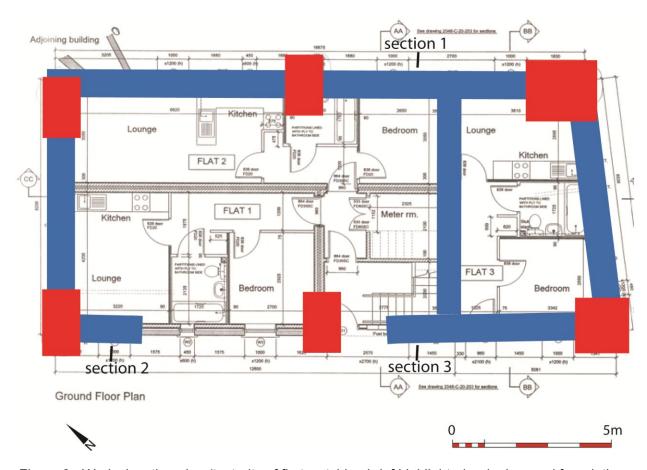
Works location plan (test-pits of first watching brief highlighted red, observed foundation trenches highlighted blue; location of sections indicated)
